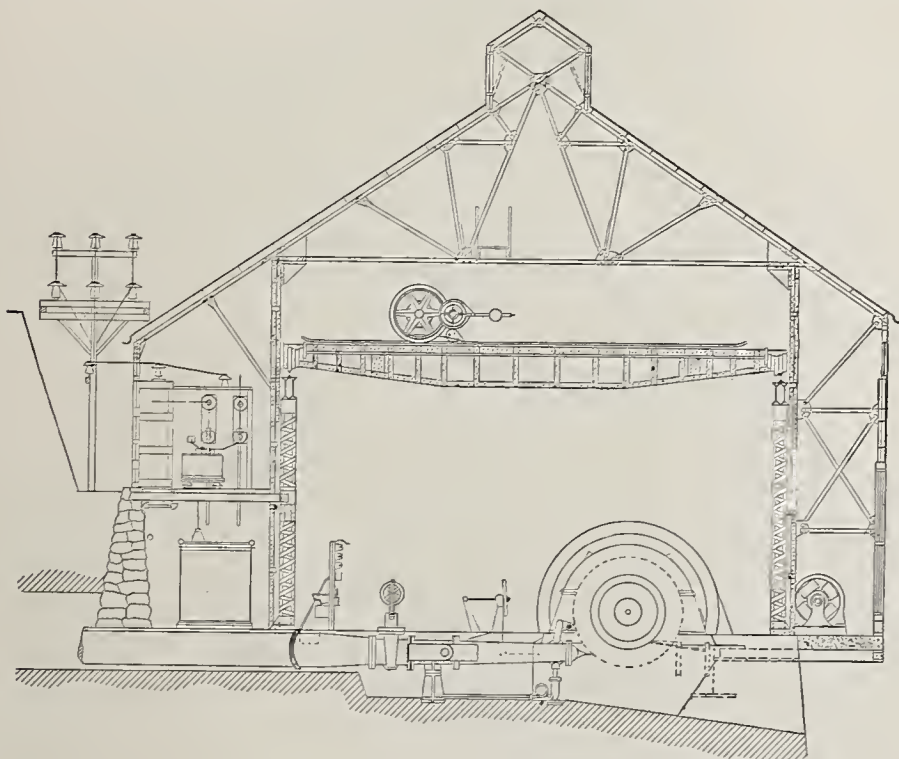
NEW ARRANGEMENT OF FIREPROOF SWITCH GALLERIES, ETC.
